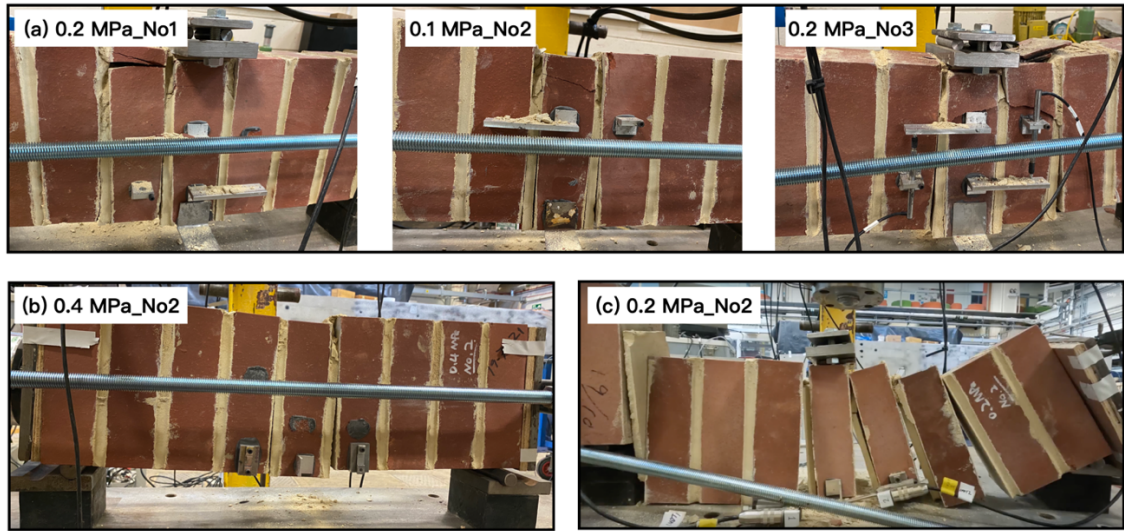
Failure modes of masonry flat arches under static loads. (a) Cracking of brick; (b) mortar crushing and shear failure of the specimen; and (c) collapse of the specimen.
